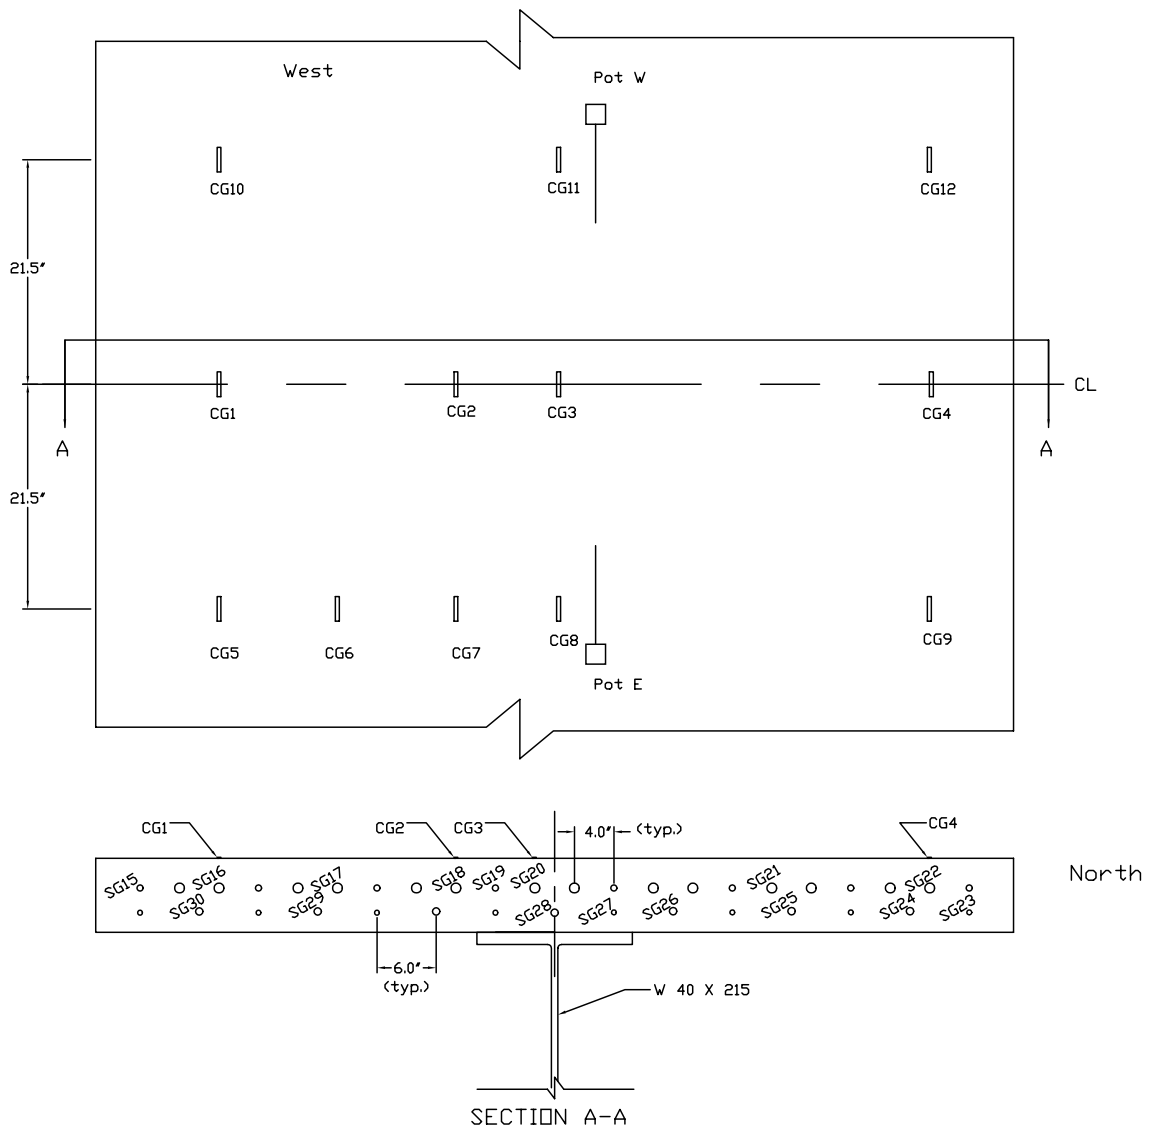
Deck and Reinforcing Steel Instrumentation Layout
